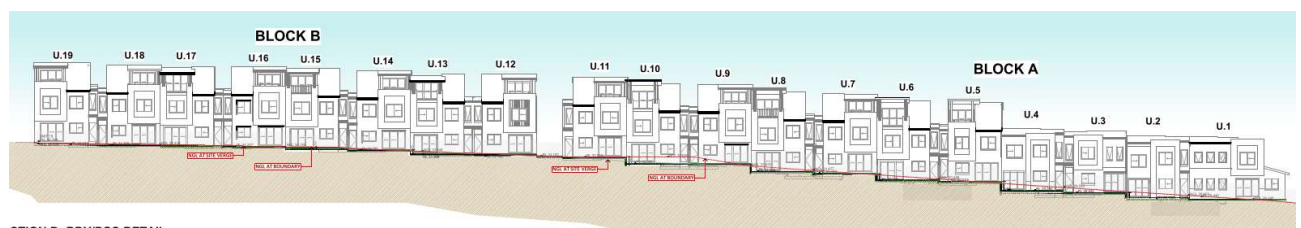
Proposed West Elevation facing Orange Grove Road/Cumberland Highway.
